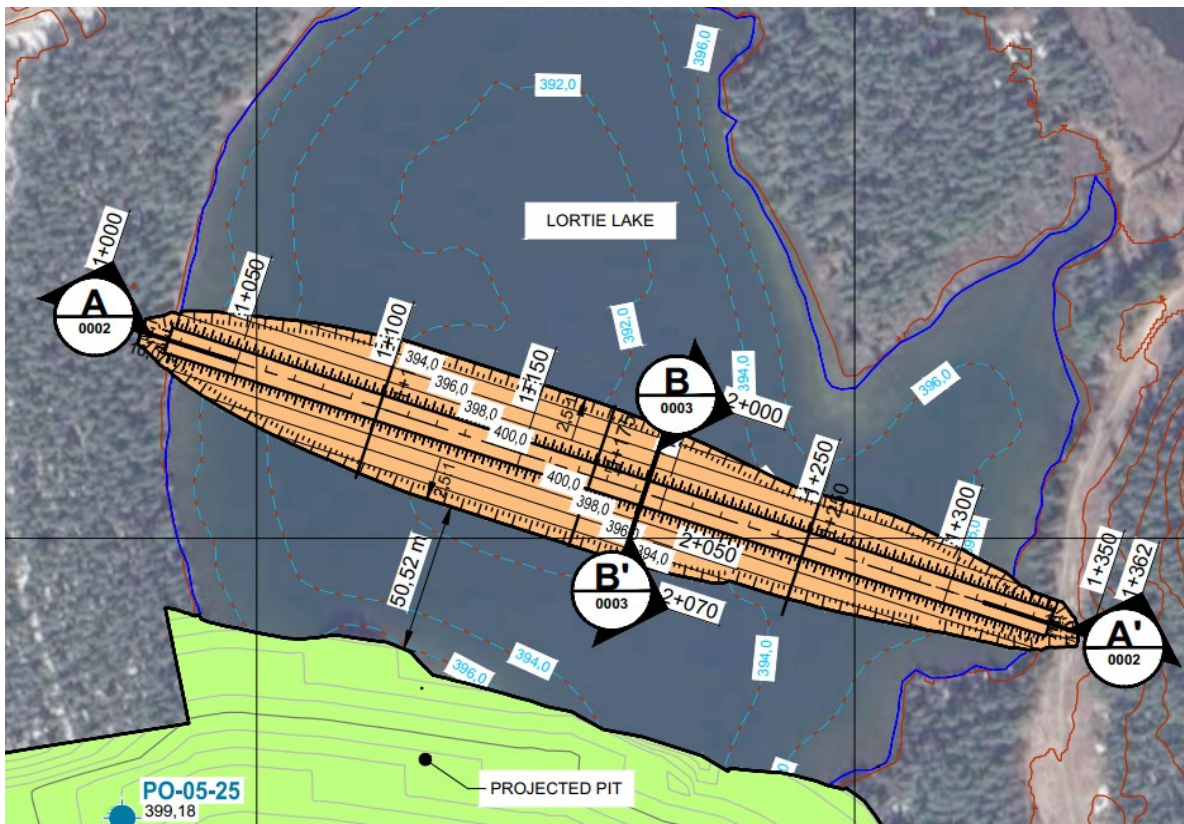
Plan View of the proposed Lortie Lake dyke
